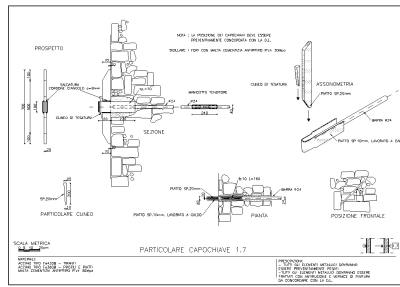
Detail of a steel tie-rod anchoring the two outer wythes of stone masonry to the inner mortar bed
